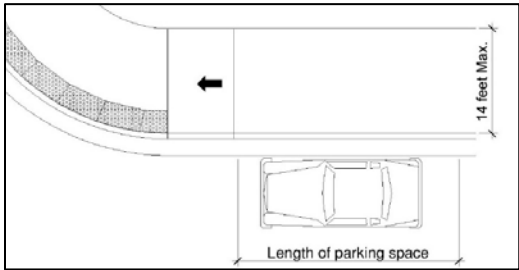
Parallel On-Street Parking Space Next to a Narrow Sidewalk
